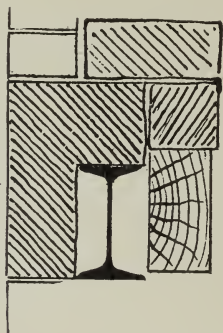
One I-Beam Supporting Stone Lintel and Its Load.
